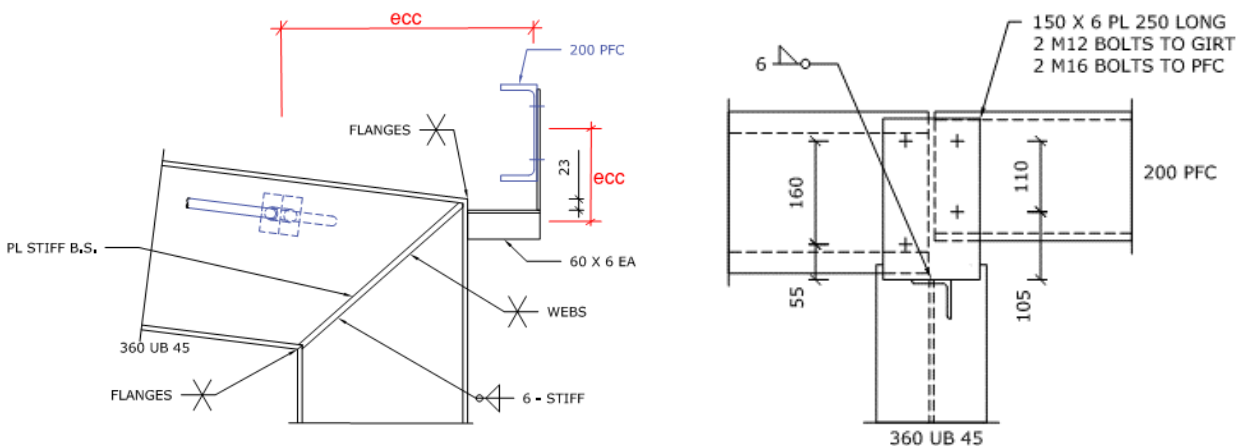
Connection of tension brace to strut in section (left) and elevation (right)
